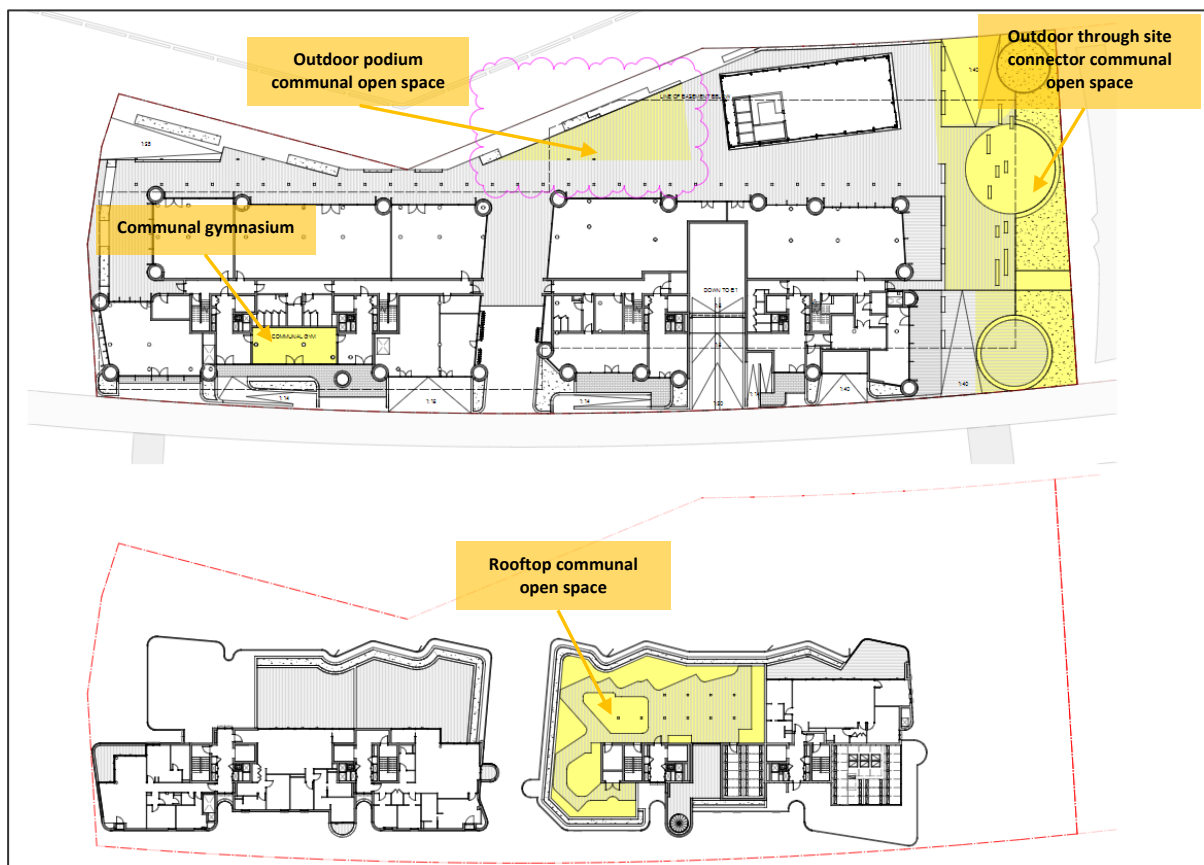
| Communal open space (Source: Adapted from Applicant's RRTS).
